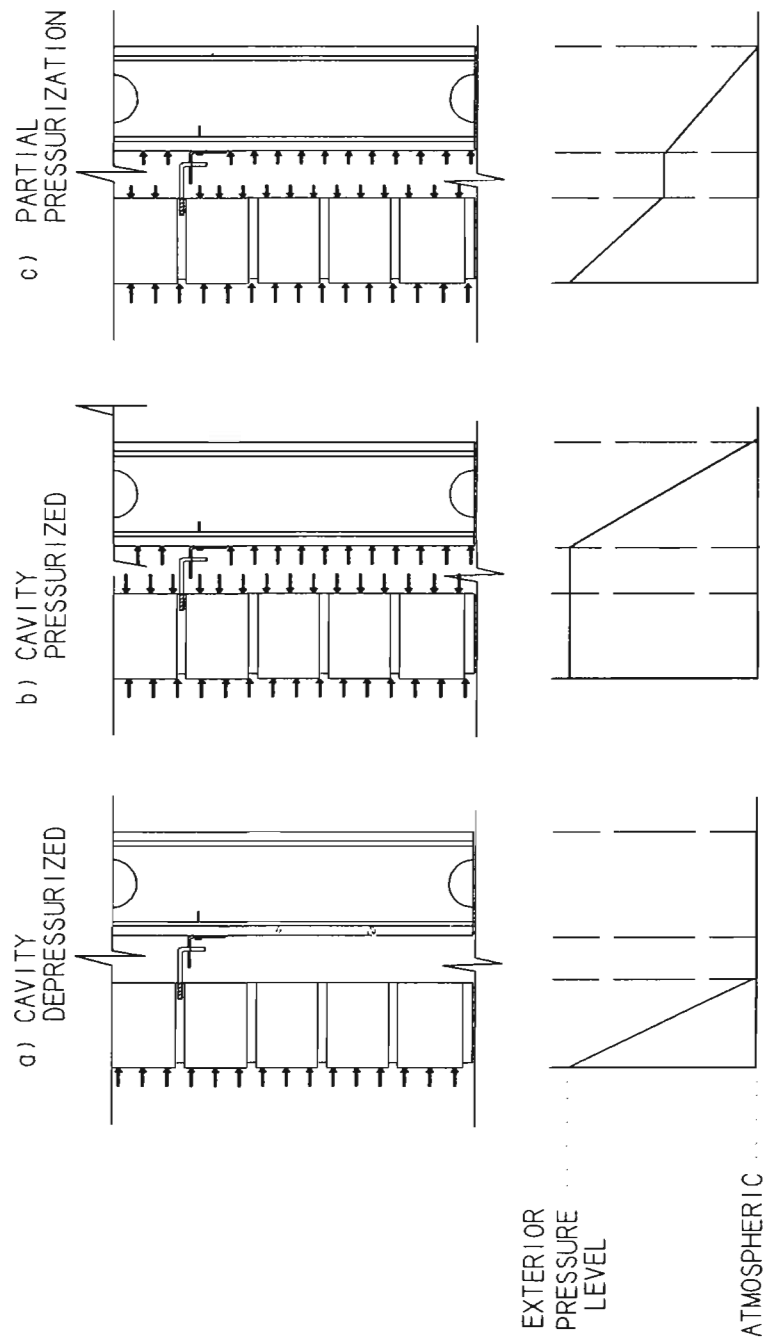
LOCATION OF PRESSURE GRADIENT IN BRICK VENEER STEEL STUD WALL SYSTEM
